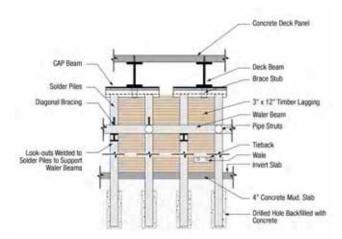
Cut and Cover with Soldier Pile and Lagging
